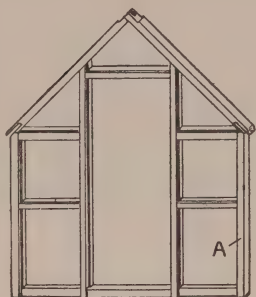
Framing of Door End of Span-roof Greenhouse
